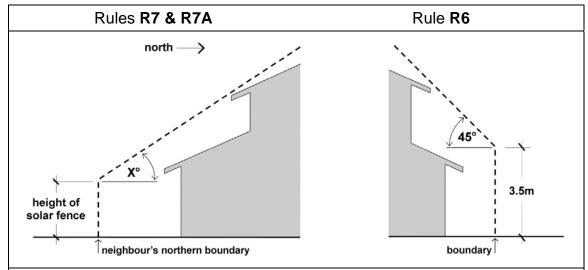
Typical building envelope for rule R6 and solar building envelope for rules R7 & R7A
